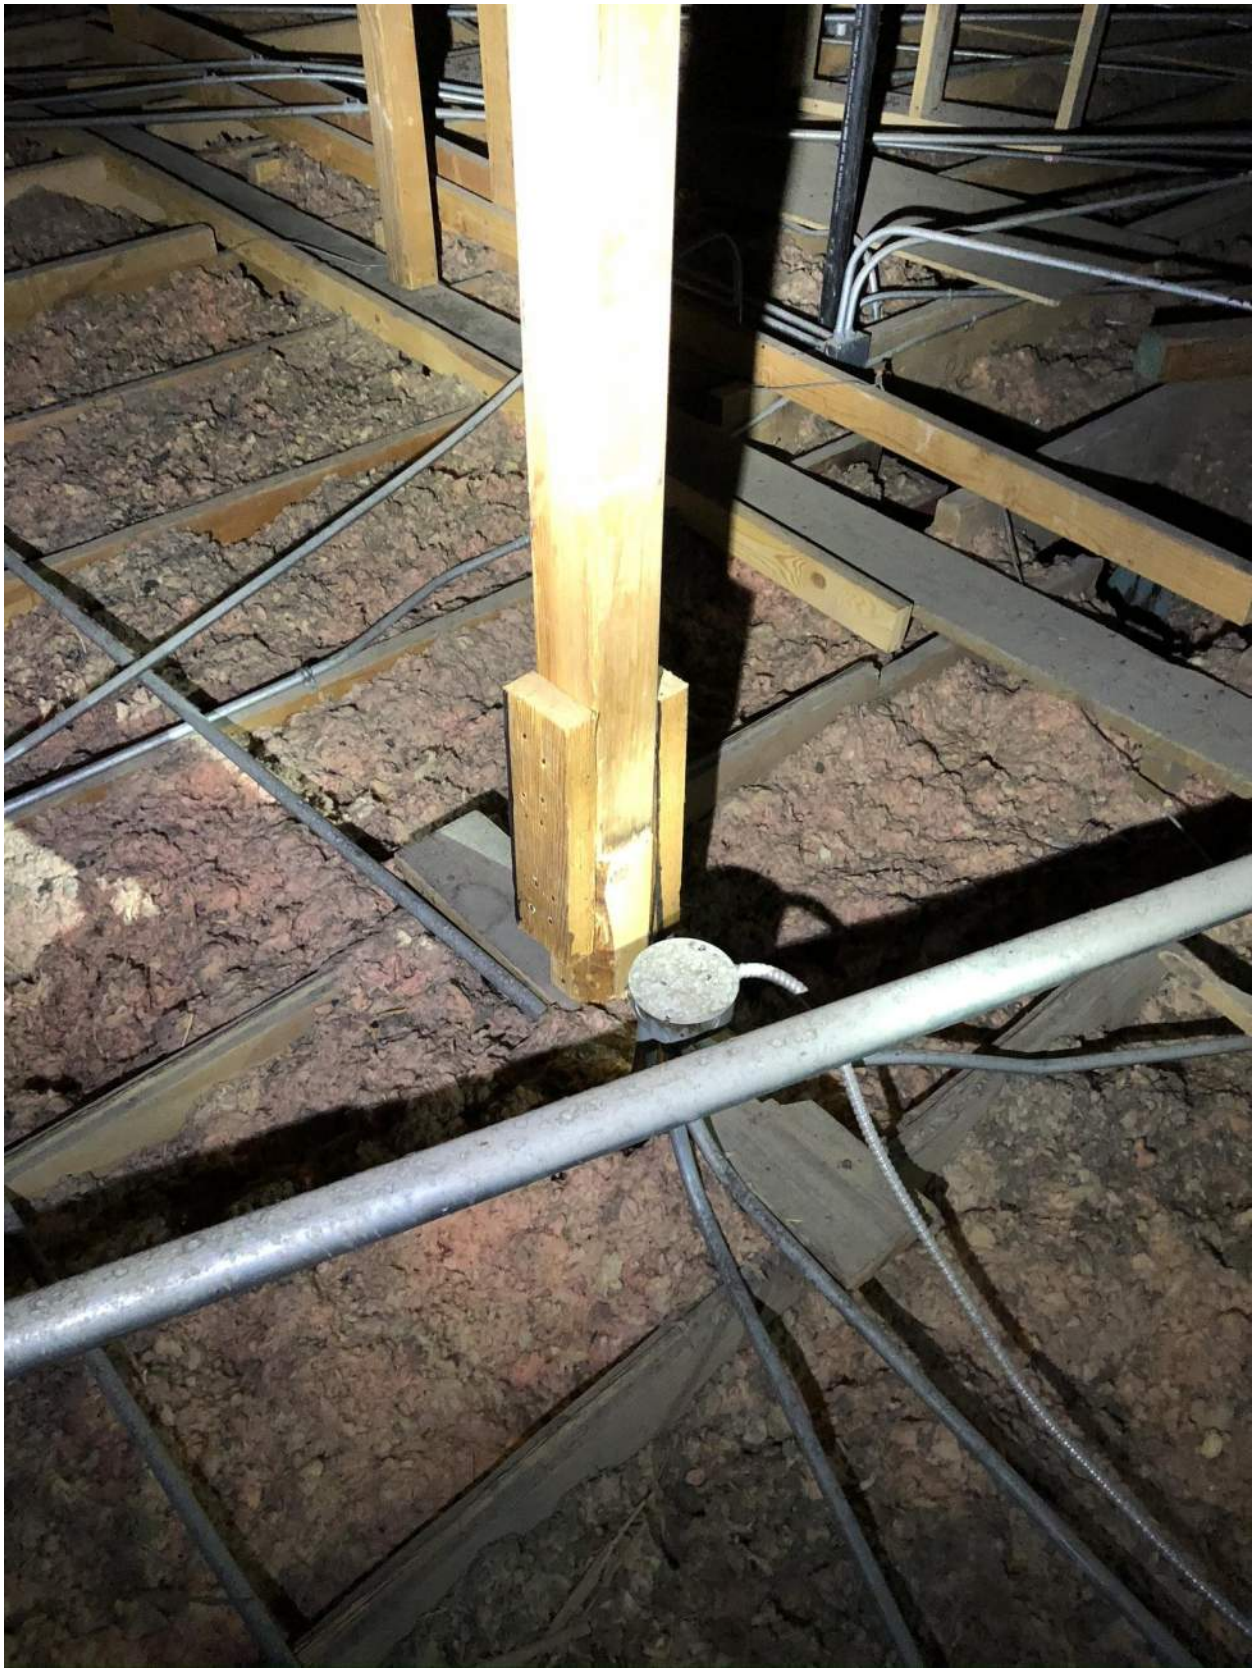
Existing roof framing over classroom area. Scabbed together, unstable support brace.
